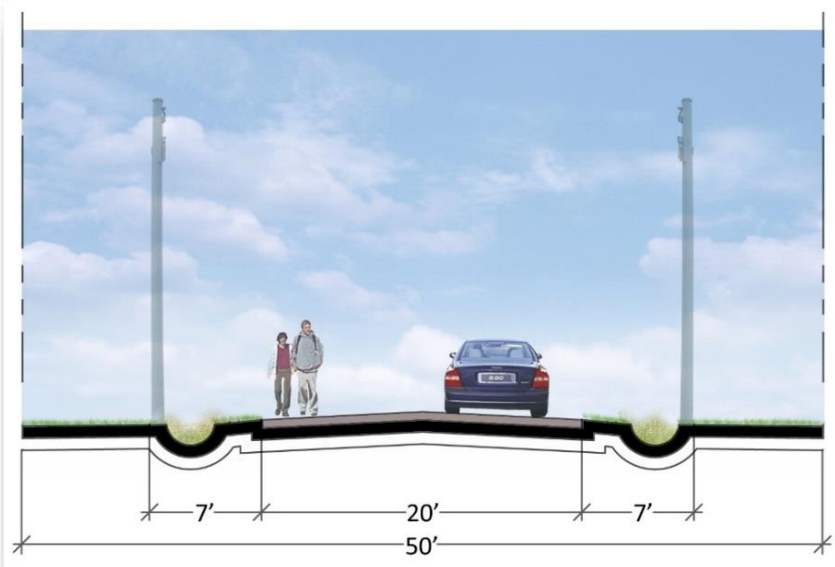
Existing Roadway and Drainage System (Looking south from Chicken Point Road)
